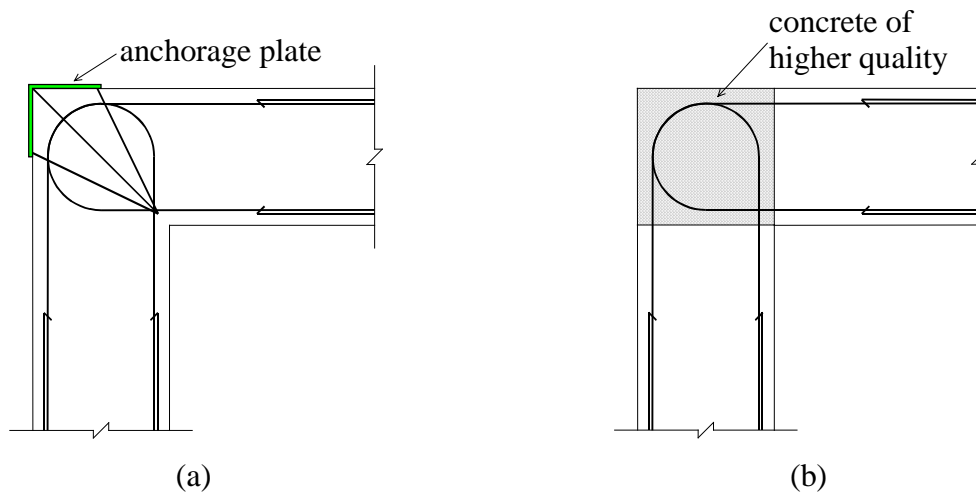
Suggestion of possible improvements in the detailings used in opening frame corners.
